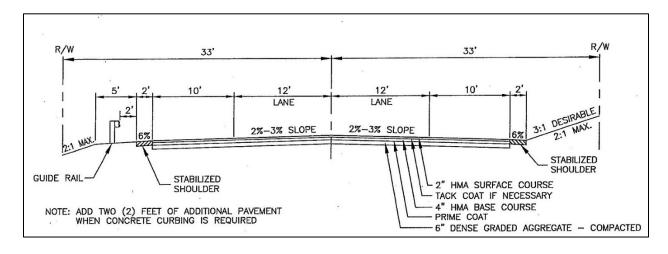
Minor Arterial Cross-Section (1982 Plan)
